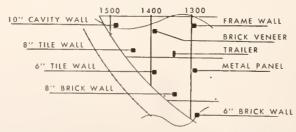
Plot plan of test site showing arrangements of thermal huts.
